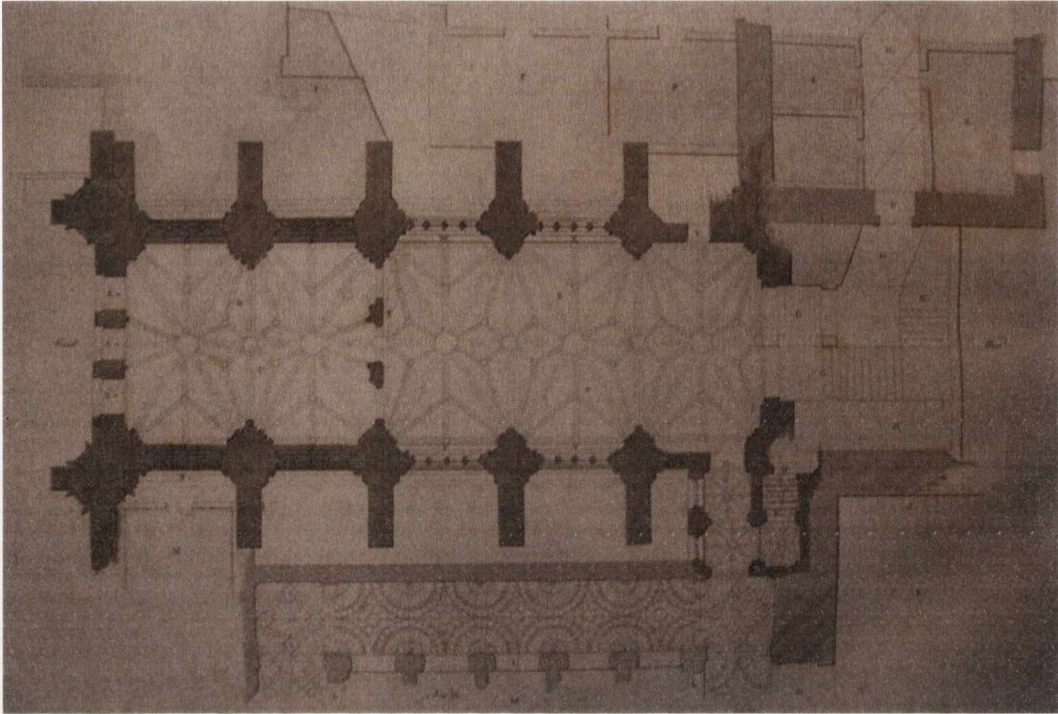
St Stephen's Chapel, Westminster, ground plan showing reflected ceiling plan, from Carter, *Plans, elevations, sections and specimens of the architecture and ornaments of St Stephen's Chapel, Westminster* (1795) pl. 2.
